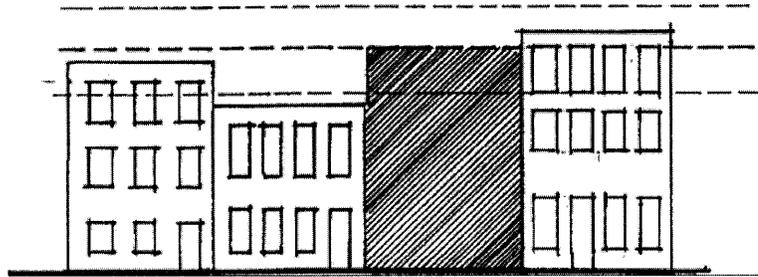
Schematic elevation sketch of a mixed use streetscape. To create a visually unified street wall, buildings should be no more than 30% taller or 30% shorter than the average building height on the block.
